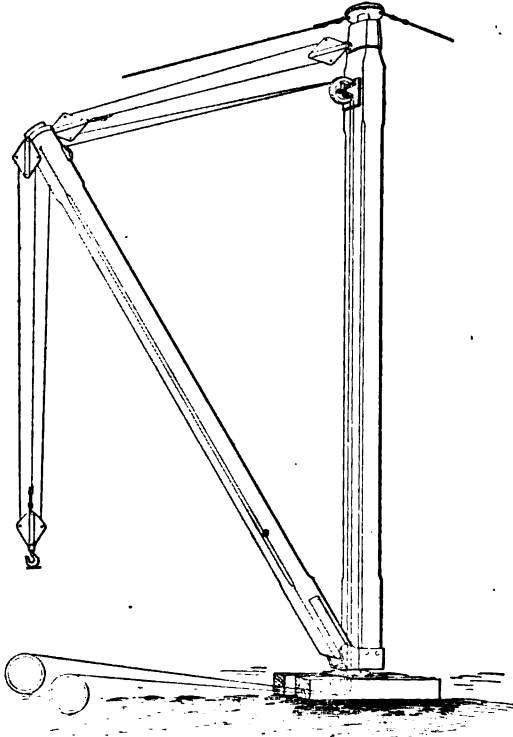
DOUBLE-DRUM GUY DERRICK, AMERICAN HOIST AND DERRICK CO.
